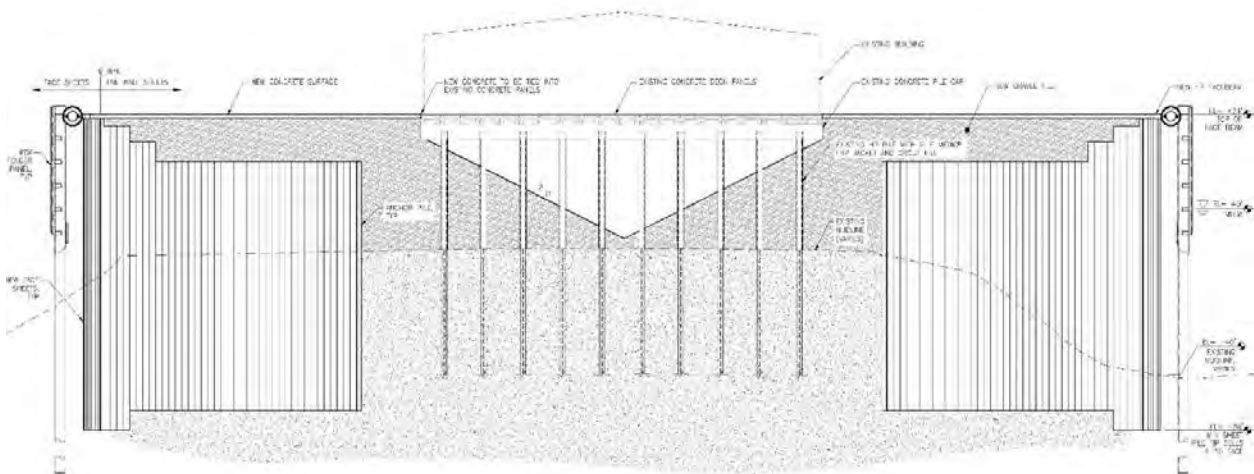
Option 3 – Section of Open Cell with Existing Building Foundation Piles Reinforced
